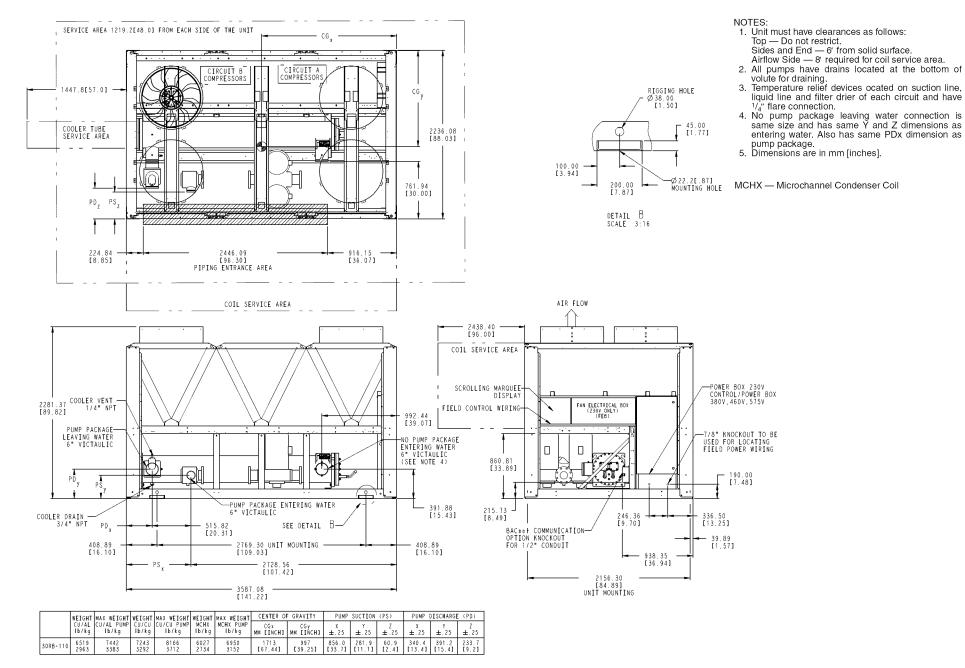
30RB110 Air-Cooled Chiller Dimensions
